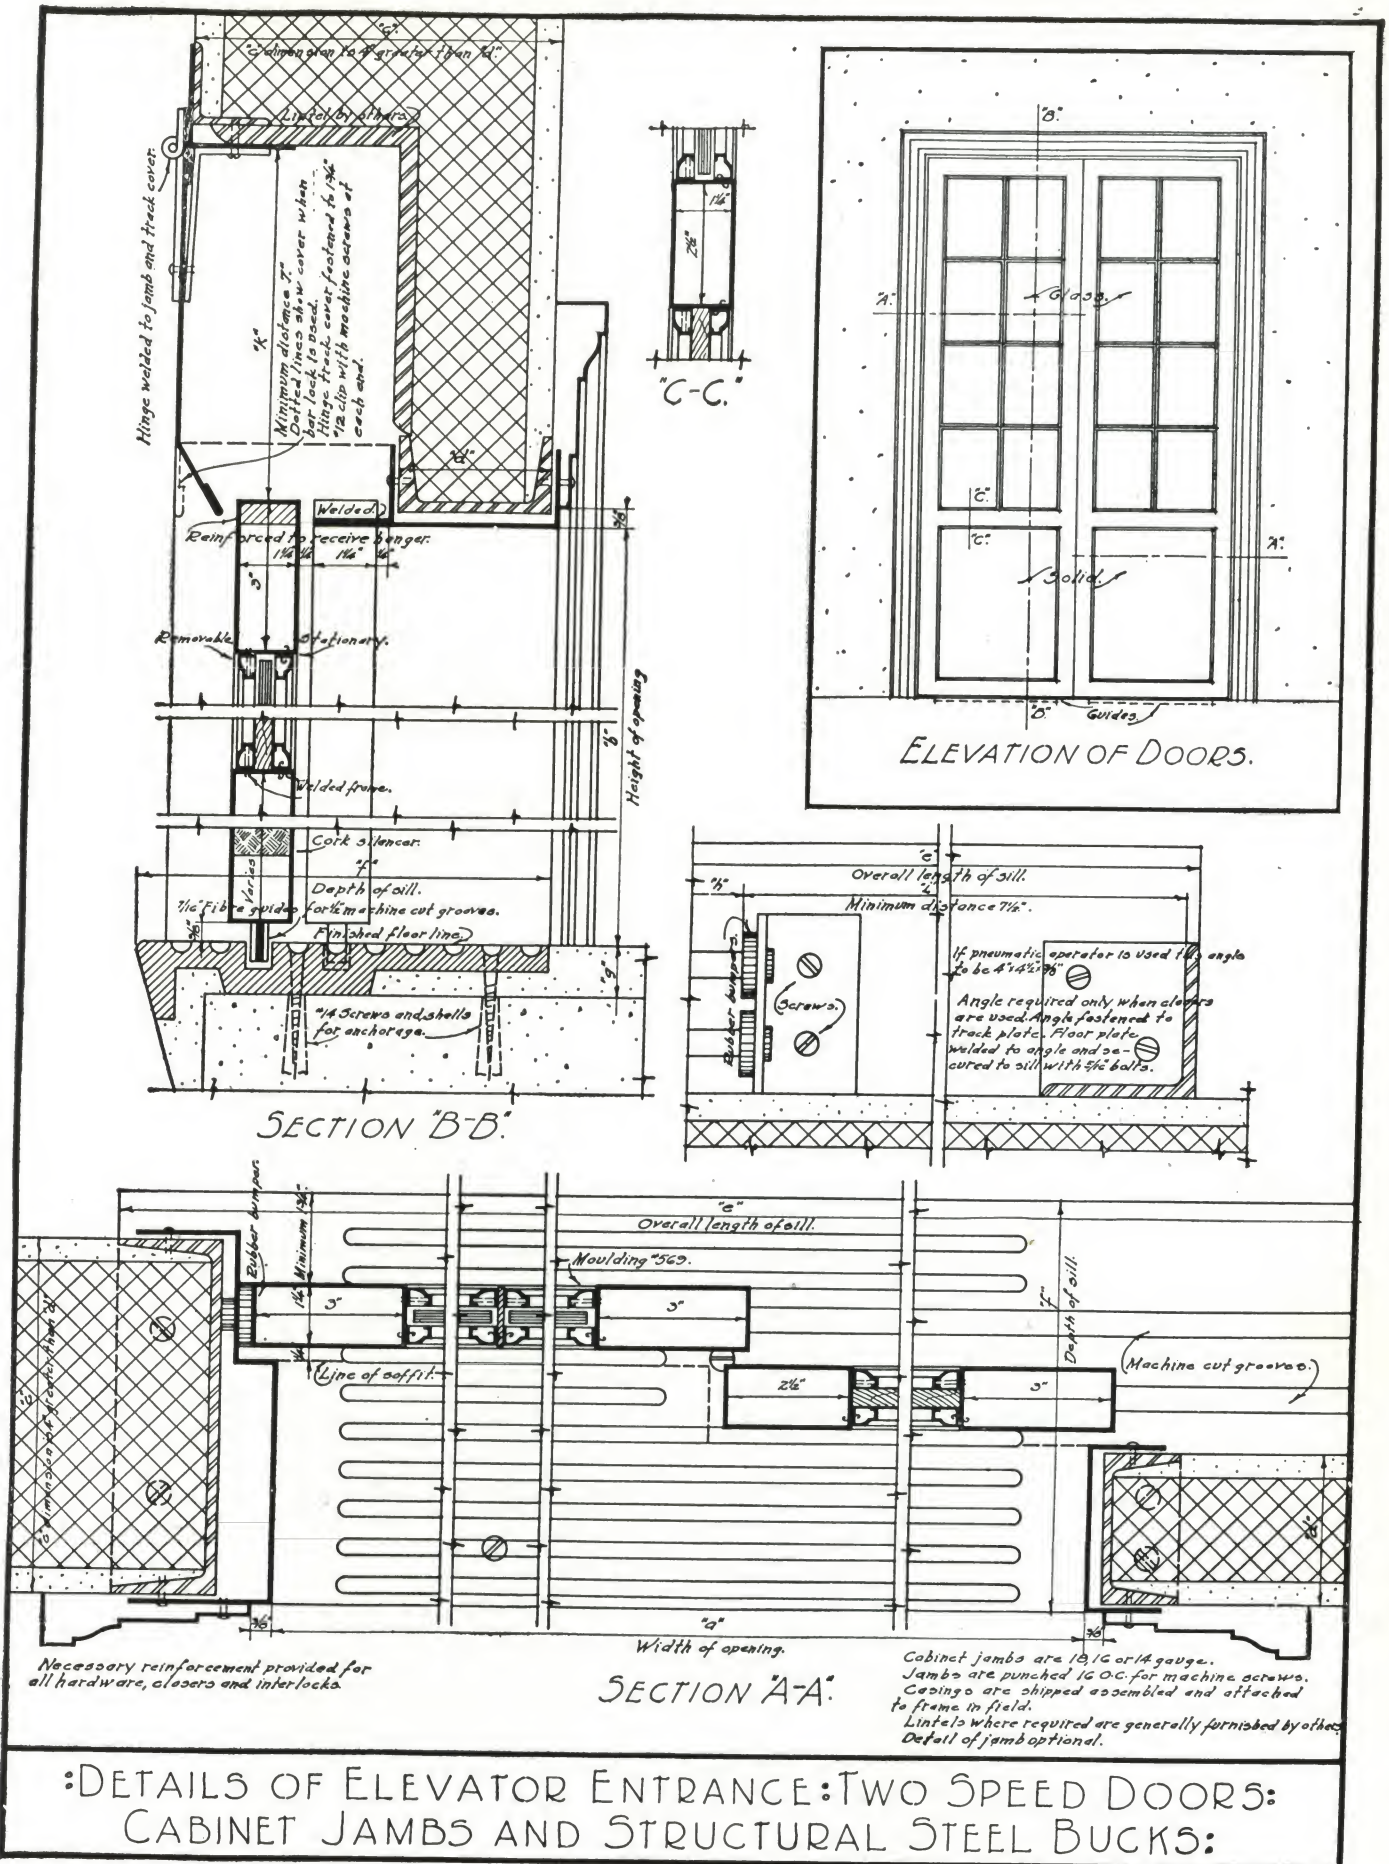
Typical Detail Sheet of a Thorp Elevator Opening Installation—Note Methods of Construction
